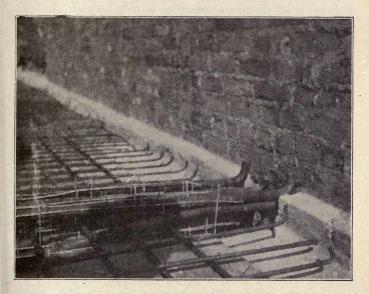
Reinforcement of Girders in Winton Garage, Chicago,
